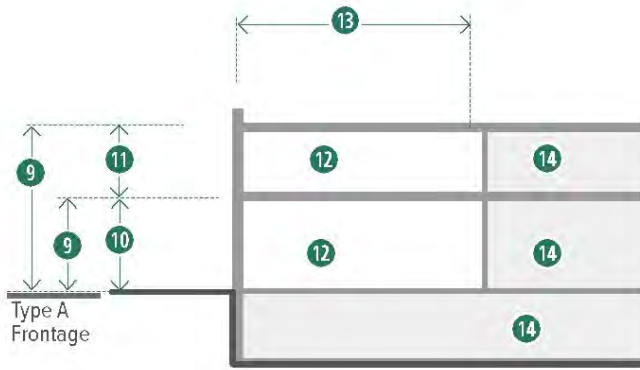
Commercial Storefront Building Section: Height & Use Requirements
